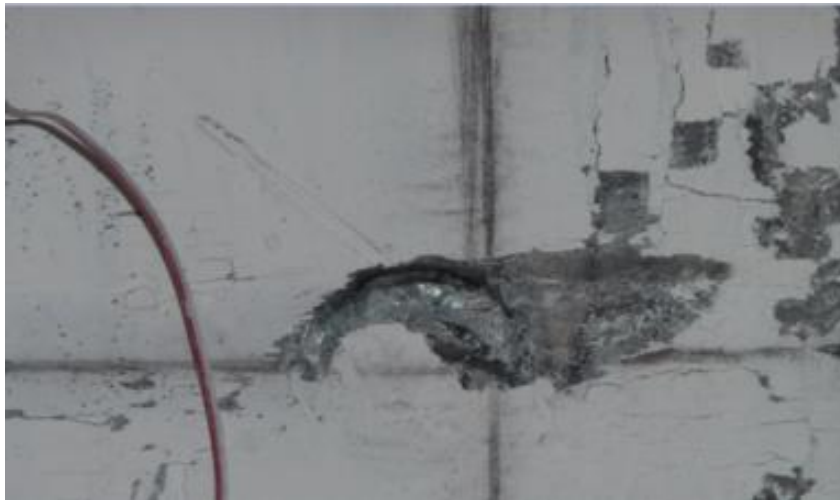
Fracture of Plug Weld at Half Diameter of Tie Bar of CFSSP-NB2 at 1.8% Drift
